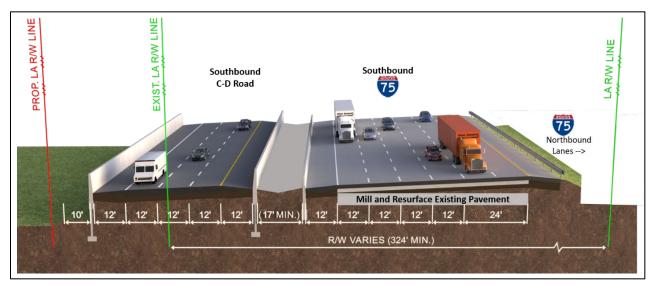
Graphically Enhanced Typical Section of Preferred Alternative
